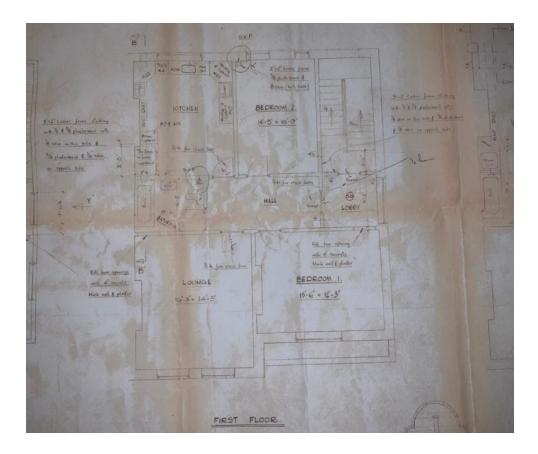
Shows planned layout of the first floor into a self contained flat. The plans show where the new partition wall was added between hall and the lobby, and the new wall and doorway added between the lobby and the communal staircase. The plans also show where the original entrance way into the W.C was blocked off in the conversion.
